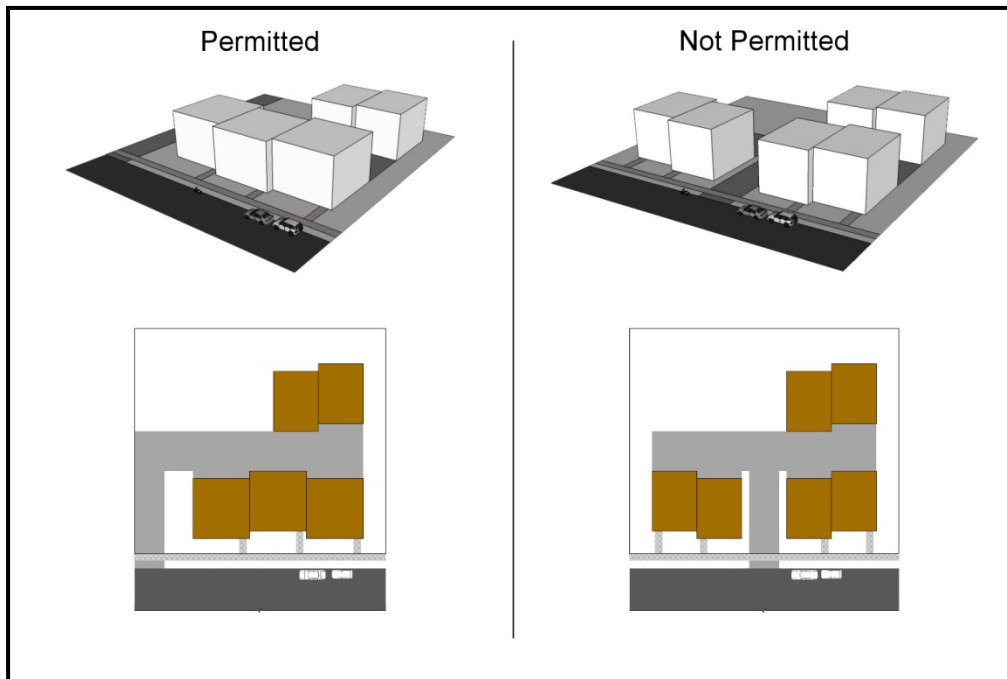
A Isometric and plan views illustrating the required number of units fronting on a street.
